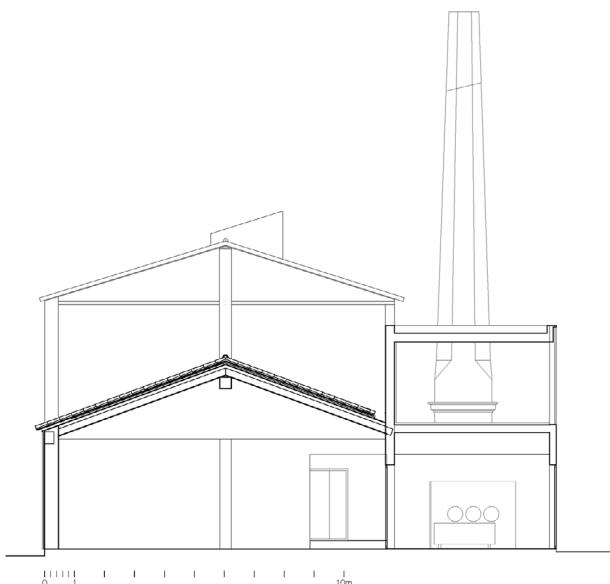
Cross section of the oven building (Source: the authors. 2018 rehabilitation project).
